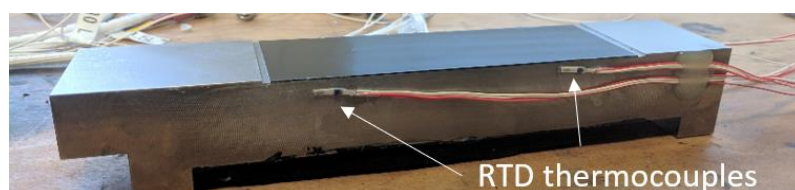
A photograph showing RTD thermocouples bonded on outer side of the steel specimen.
